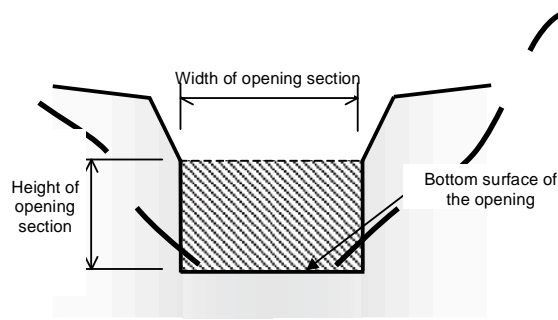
Opening section of an open type Sabo dam (the part in diagonal pattern)
